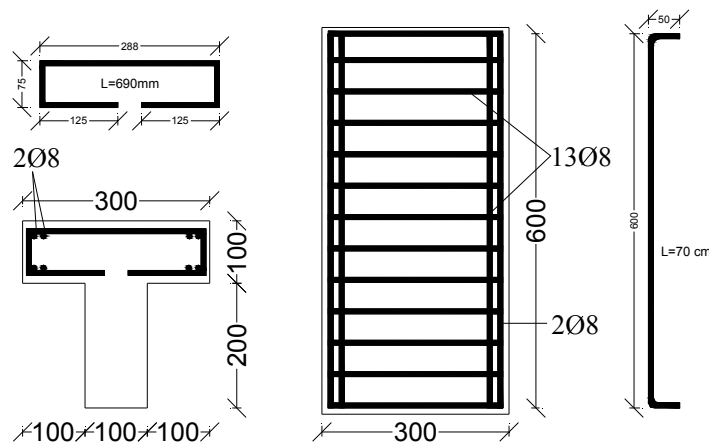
Reinforcement layout and geometry of specimen 3 (Specimen code 3.3 - loading at 1/4 of the length).
